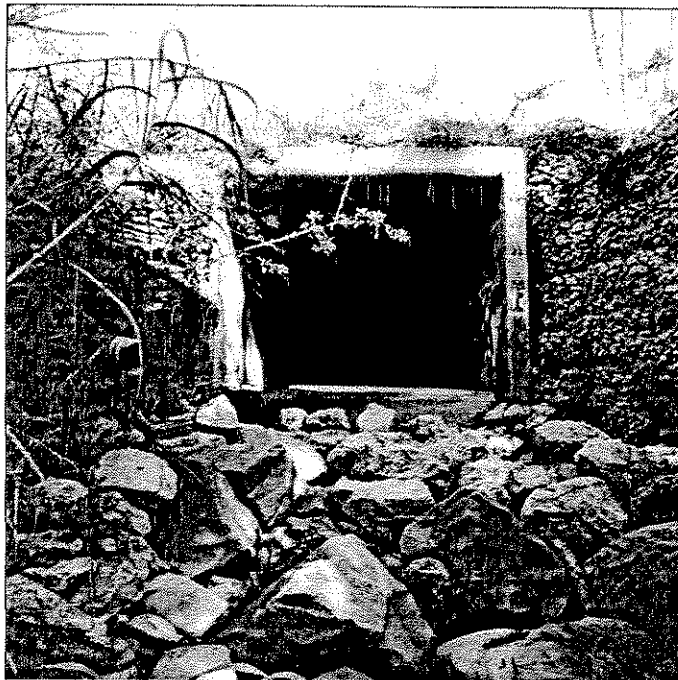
Boulders placed at culvert outlet to stabilize degrading bed
